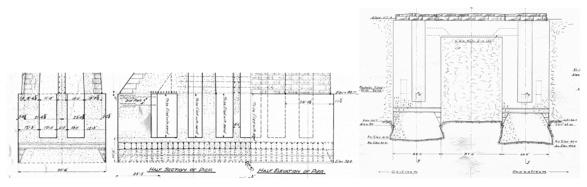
Foundations for Piers 24 (left) and 25 (right).
